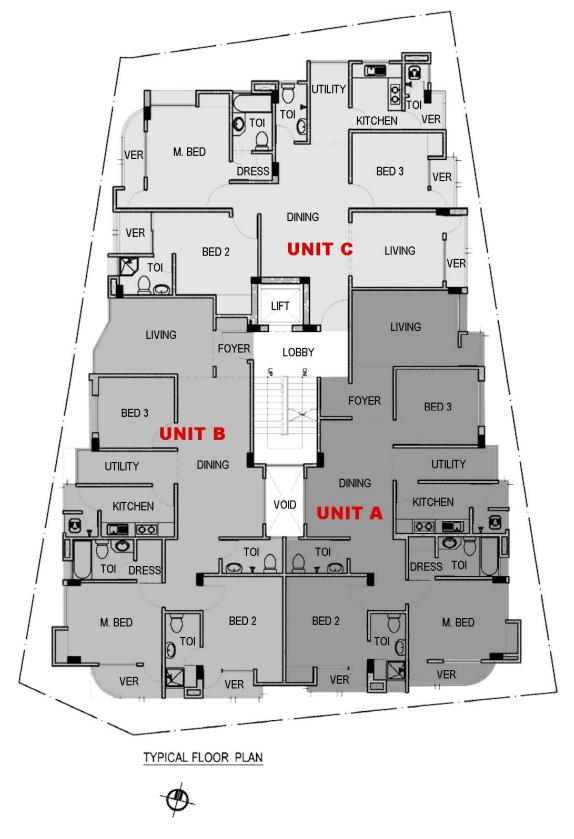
Typical floor plan showing the longer axis oriented towards the north-south direction
